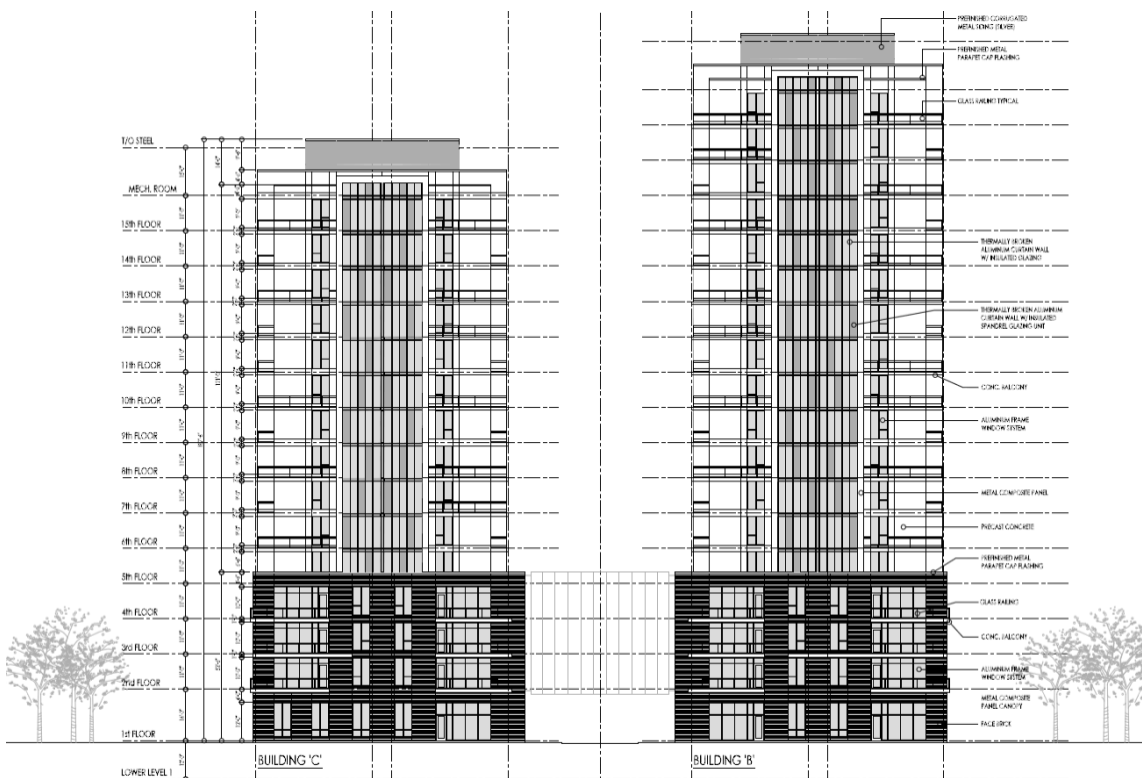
South Elevation (Side of Building ‘C’ [Left] and Building ‘B’ [Right])
